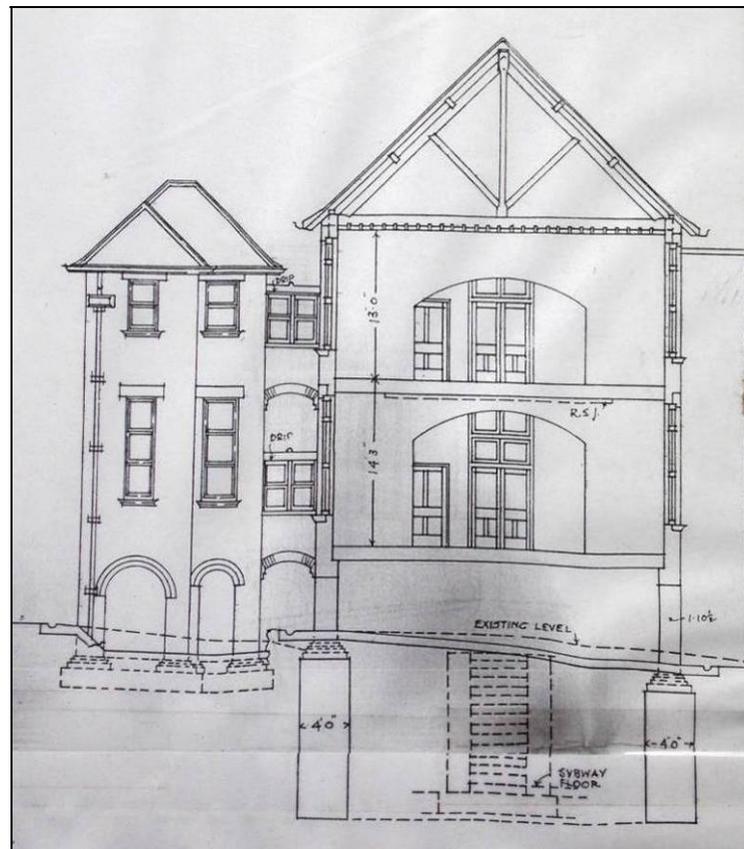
Copy of architectural drawing of Building 41 with section and elevation of the projecting tower.
